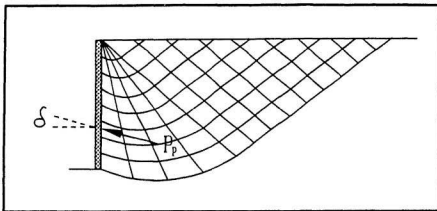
Passive Earth Pressure Failure in Front of Retaining Wall With Friction (After Craig, 1987).
